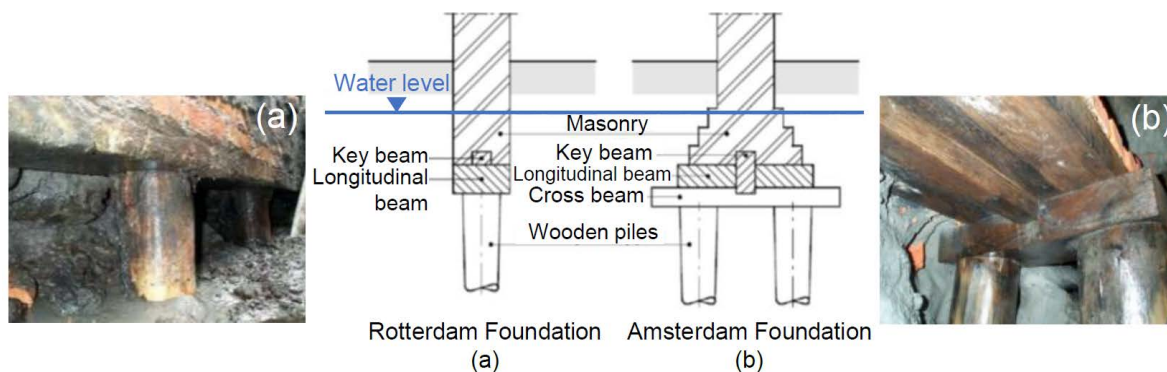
Wooden foundation types in Rotterdam (NL) and Amsterdam (NL): (a) Rotterdam foundation with a system of stand-alone wooden piles and only longitudinal beams; (b) Amsterdam foundation with cross beams and pair of piles (Adaptation from [13])
